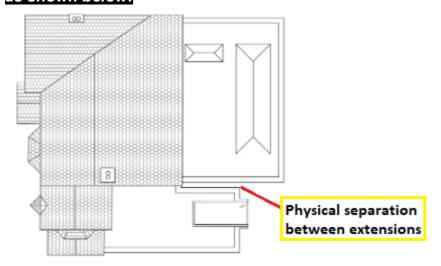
Physical separation avoiding 'wrap-around' and more than half width
